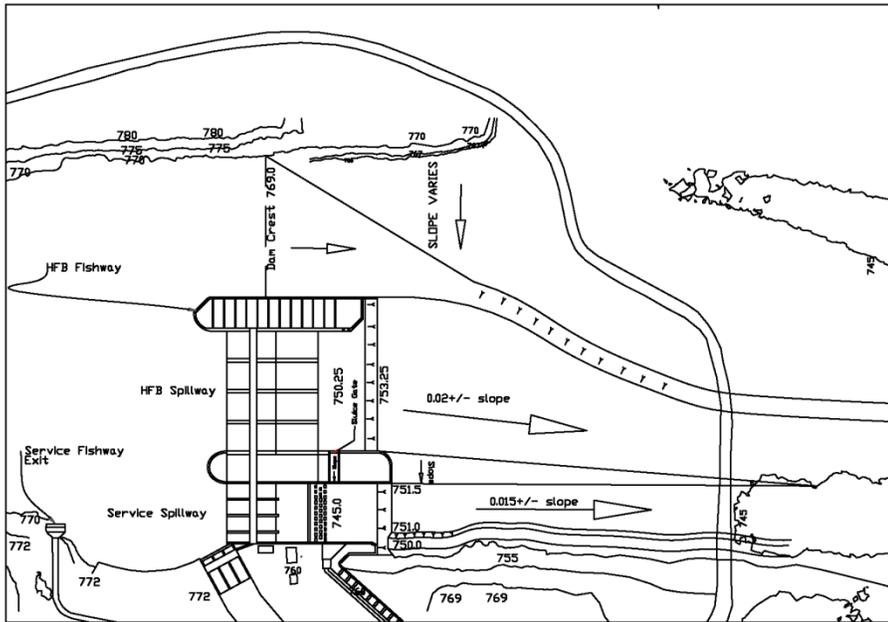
Plan view of proposed HFB spillway and new HFB fishway, (Mefford et.al., 2008).
